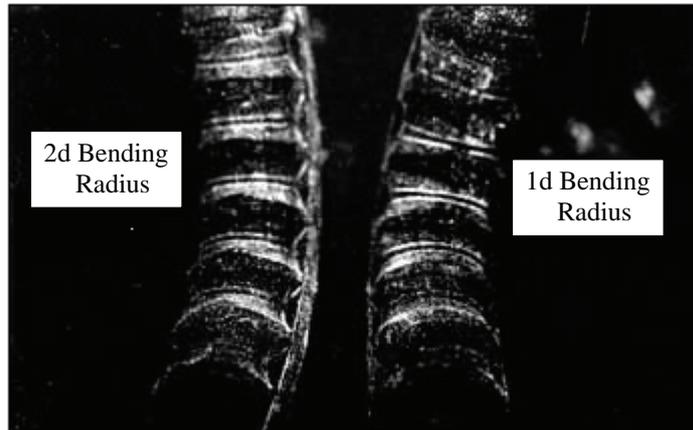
Condition of Crack (Fluorescent Magnetic Particle Inspection)
